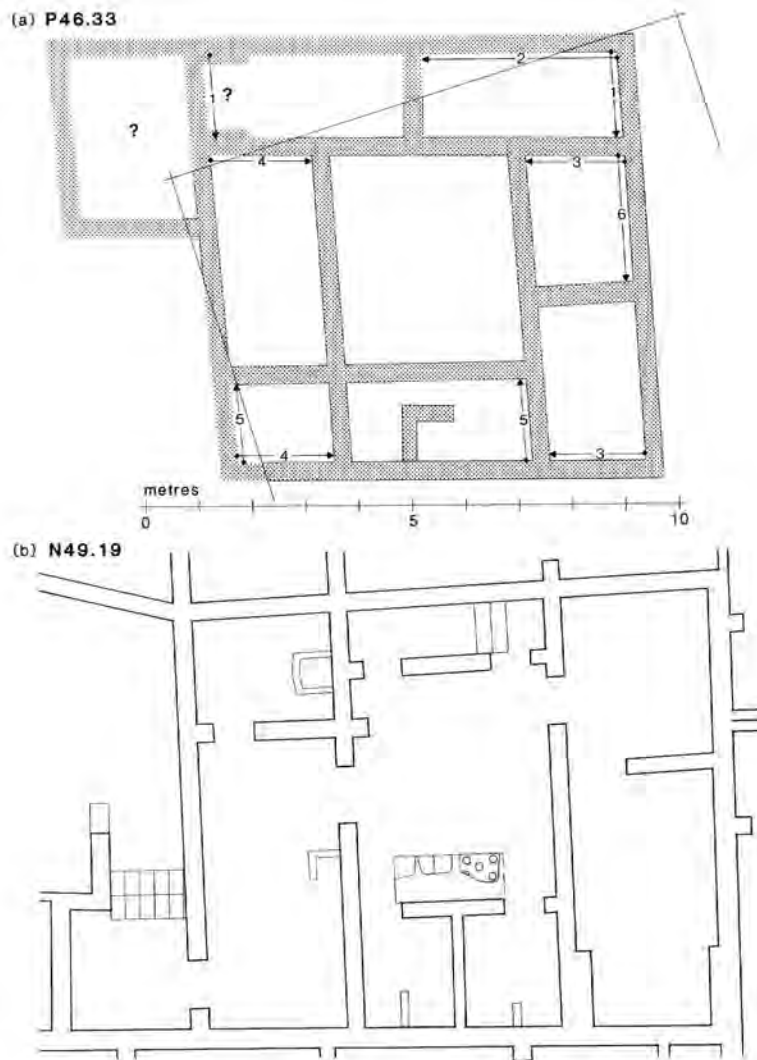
(a) outline plan of the wall framework of P46.33, partially restored, with the possible order of laying out the internal walls indicated; (b) the plan of a house of similar size, N49.19 (after *COA I: Pl. I*).
